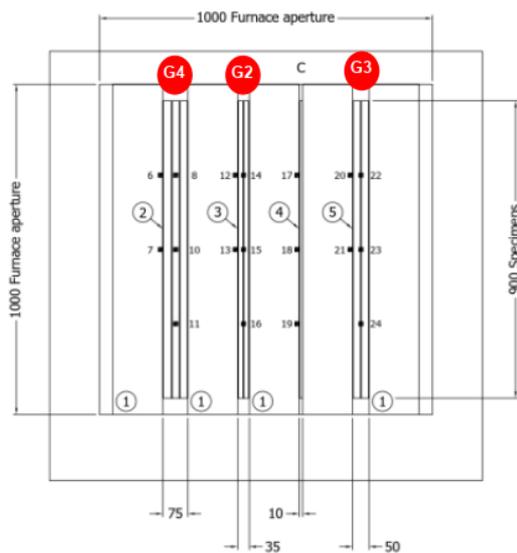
Wall linear gap systems G2-G4 – assessment 1 (as shown in WF 160399) – dimensions in mm
